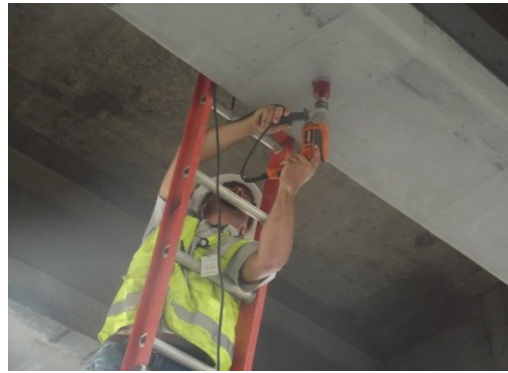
Core drilling (sample 3) in girder 4, Bridge 6
